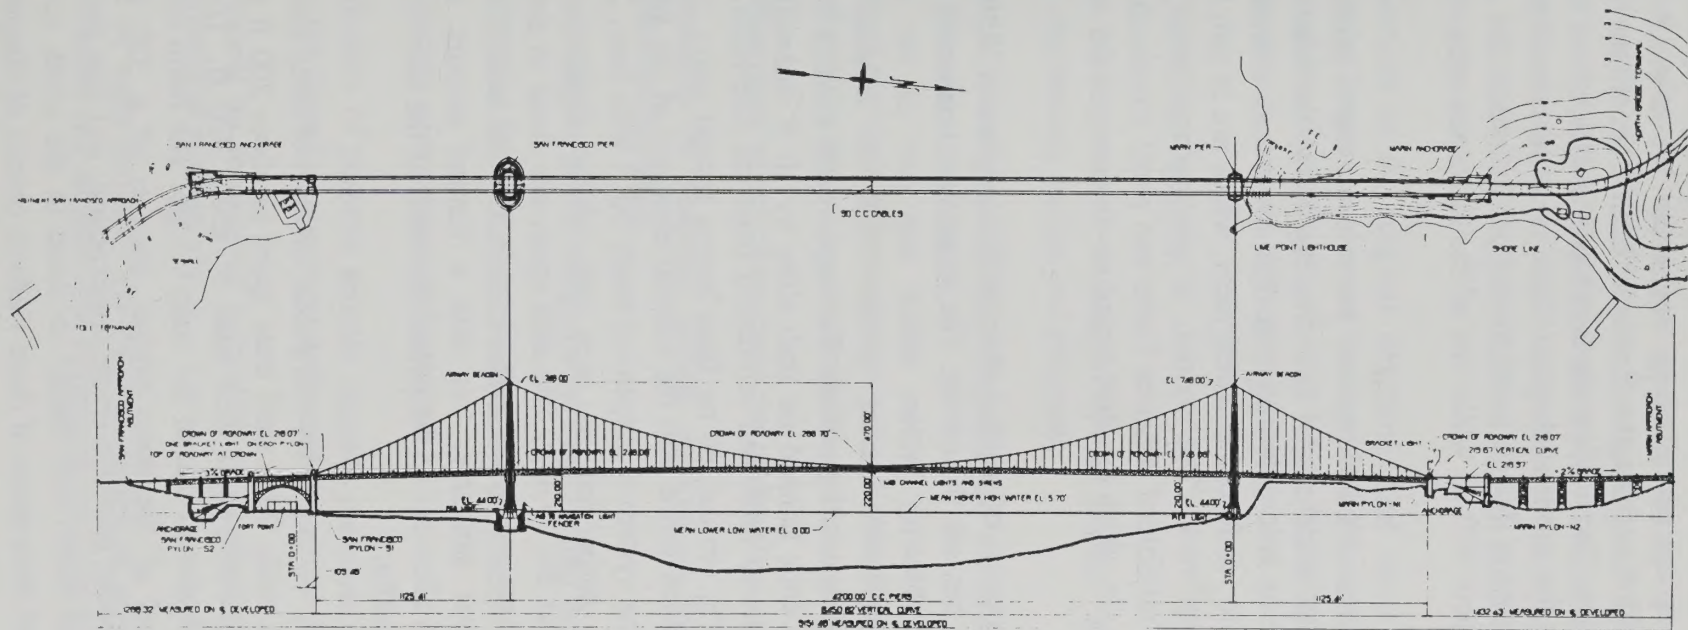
Bridge Plan and Elevation (Strauss, 1937 [1])
